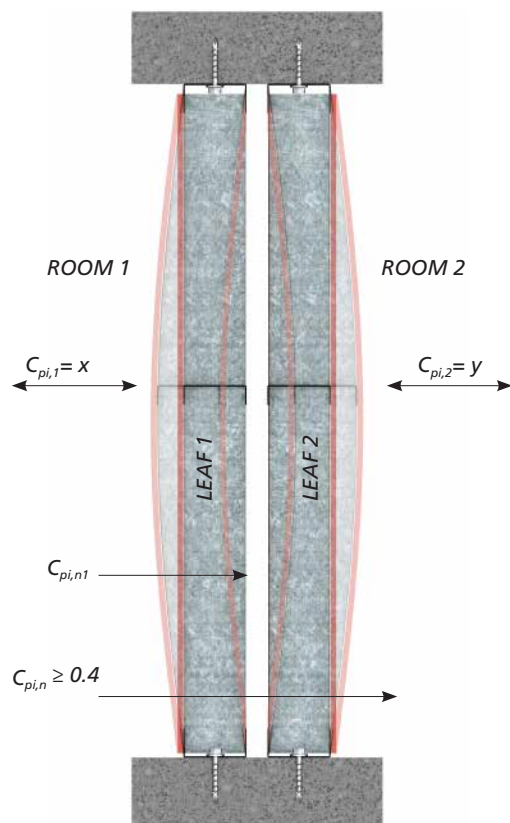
(B): PRESSURE SEALED WALL - TWIN WALL
